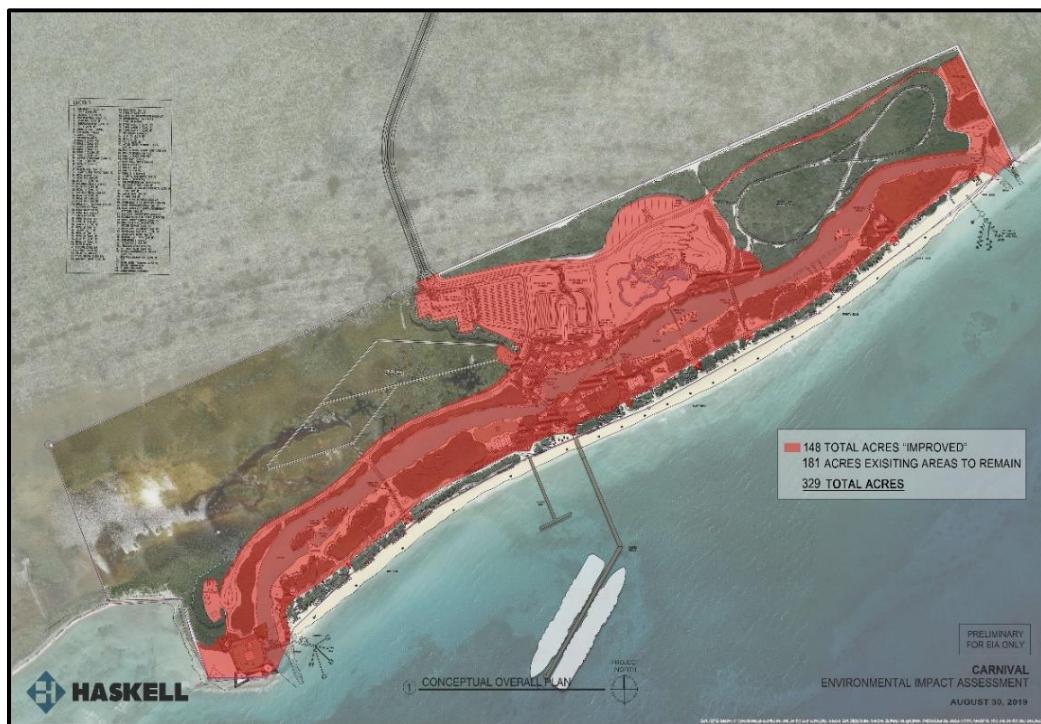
Site Plan Showing Calculated Areas of Disturbance
